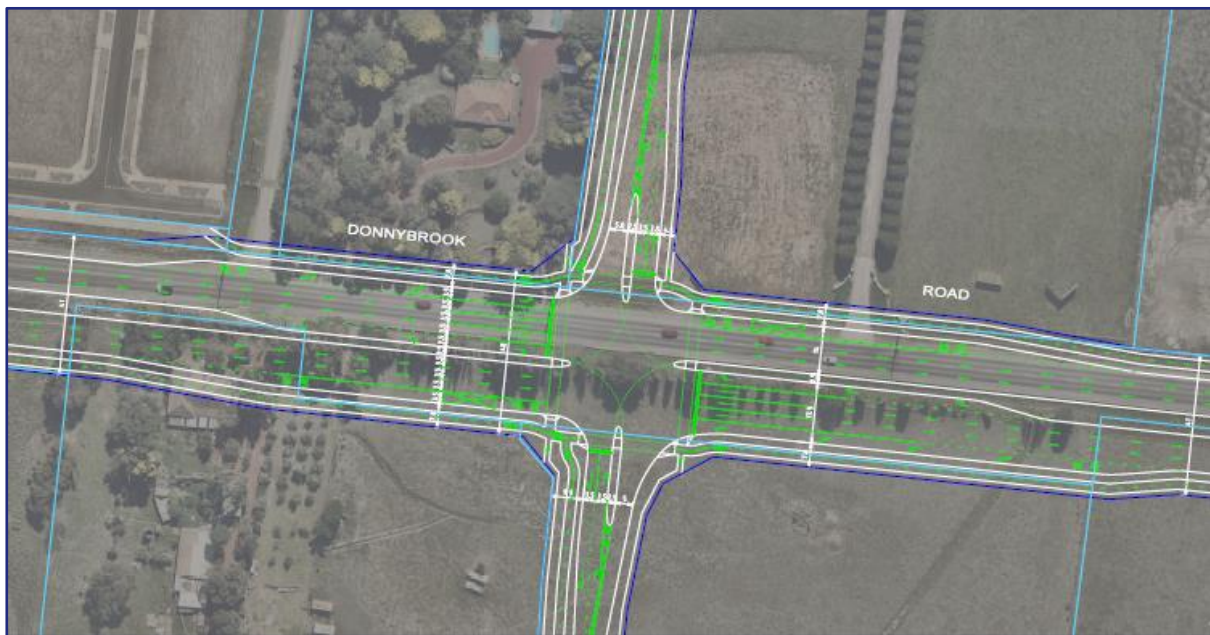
Donnybrook Road/North-South Connector Road – IN-02
